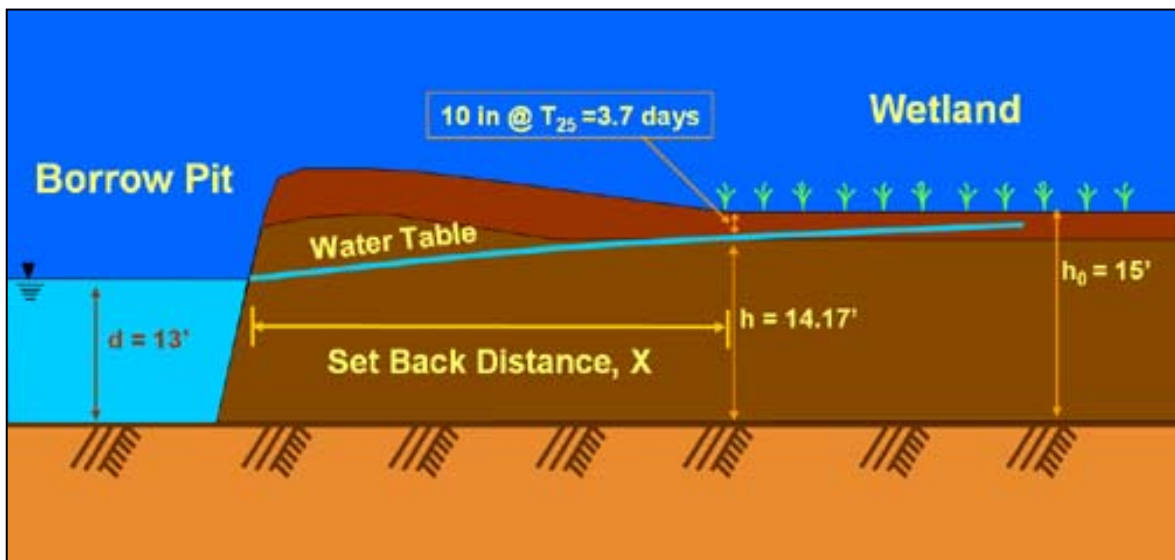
Schematic of borrow pit showing the required set back distance of the pit.
